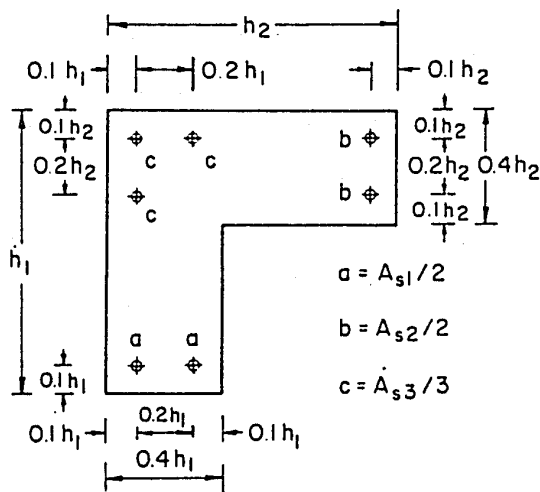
Arrangement of reinforcement.
